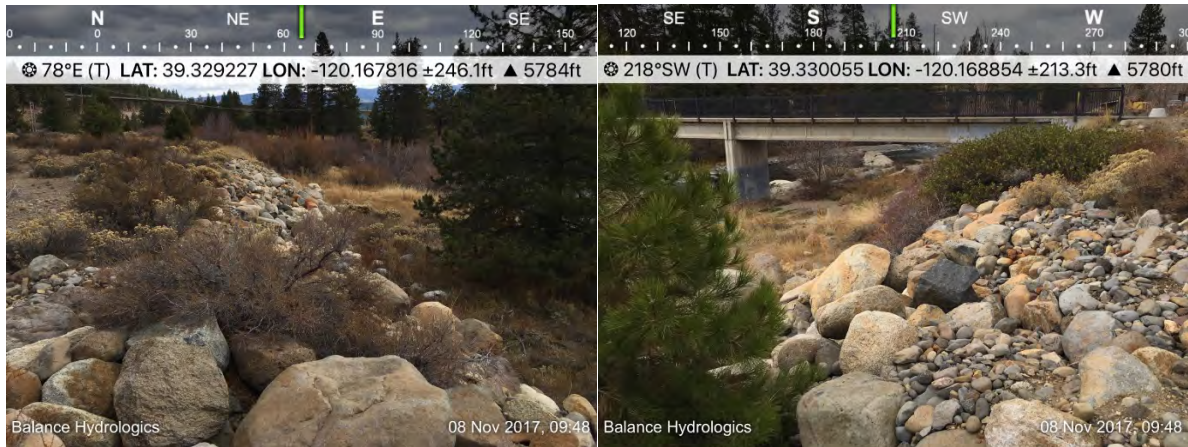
Fill Slope at Legacy Trail Bridge and Parking Area.
